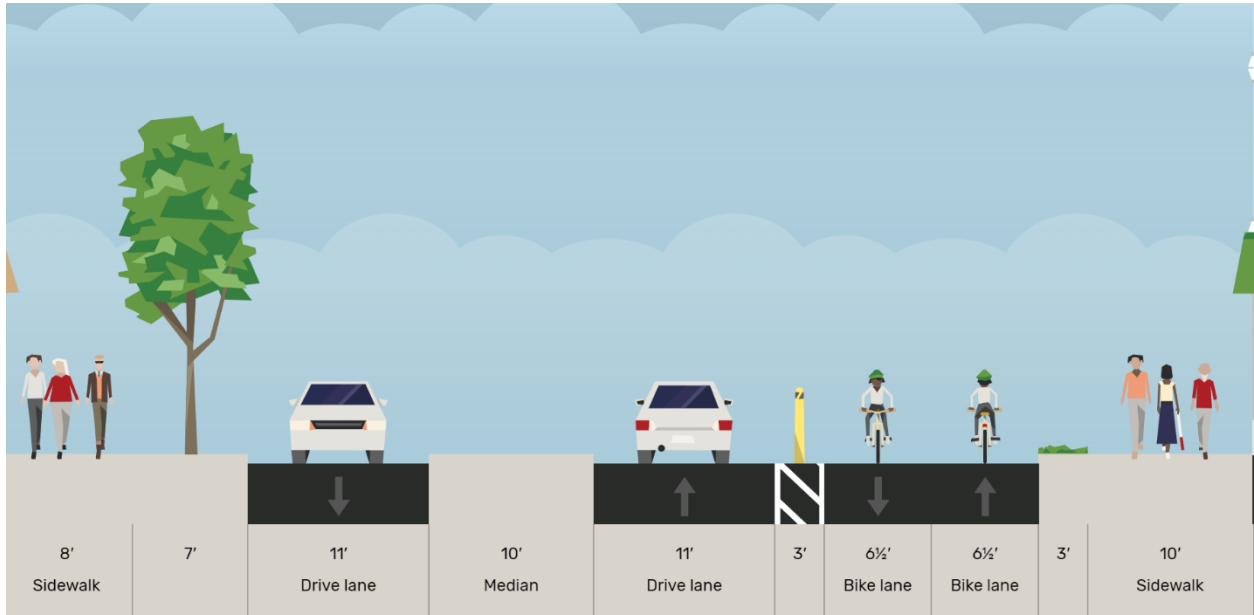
HOLLAND LANE CORRIDOR ALTERNATIVE 2 CROSS-SECTION FROM EISENHOWER AVENUE TO JAMIESON AVENUE
